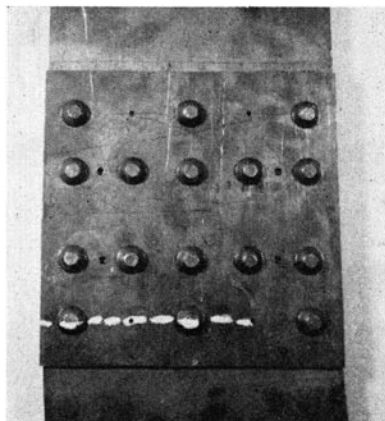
(RIGHT). FAILURE BY SHEET TENSION; DOUBLE-STRAP BUTT JOINT WITH DOUBLE ROW OF RIVETS, ALTERNATE RIVETS OMITTED FROM OUTER ROWS, SPECIMEN DED-97
